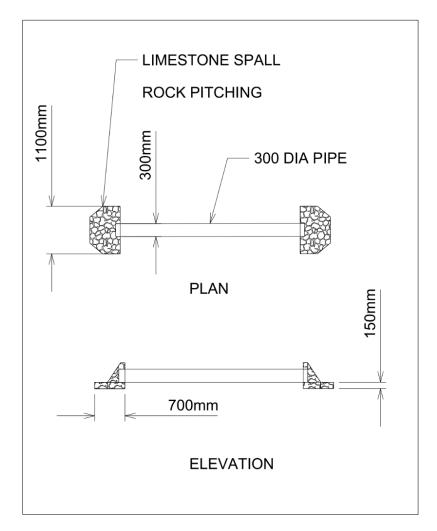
Plan for the proposed clearing area (culvert and limestone spalling)
